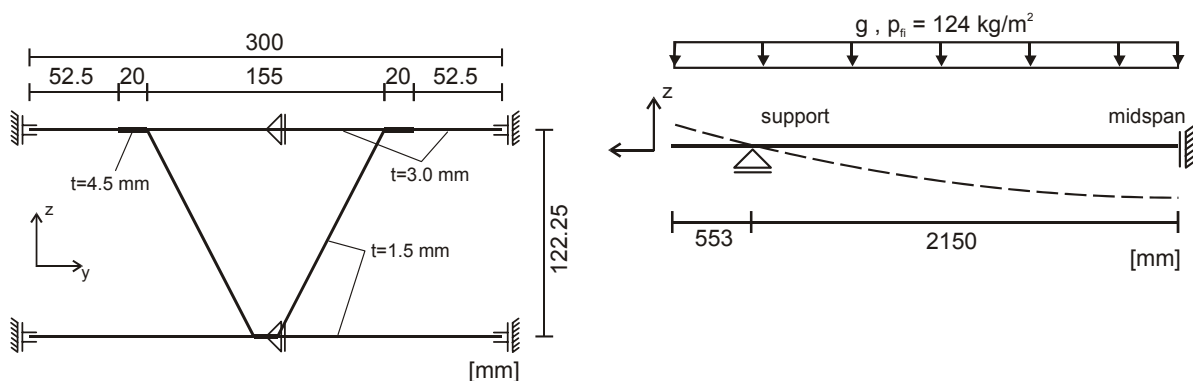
Mechanical model for floor element. Continuous boundary conditions
